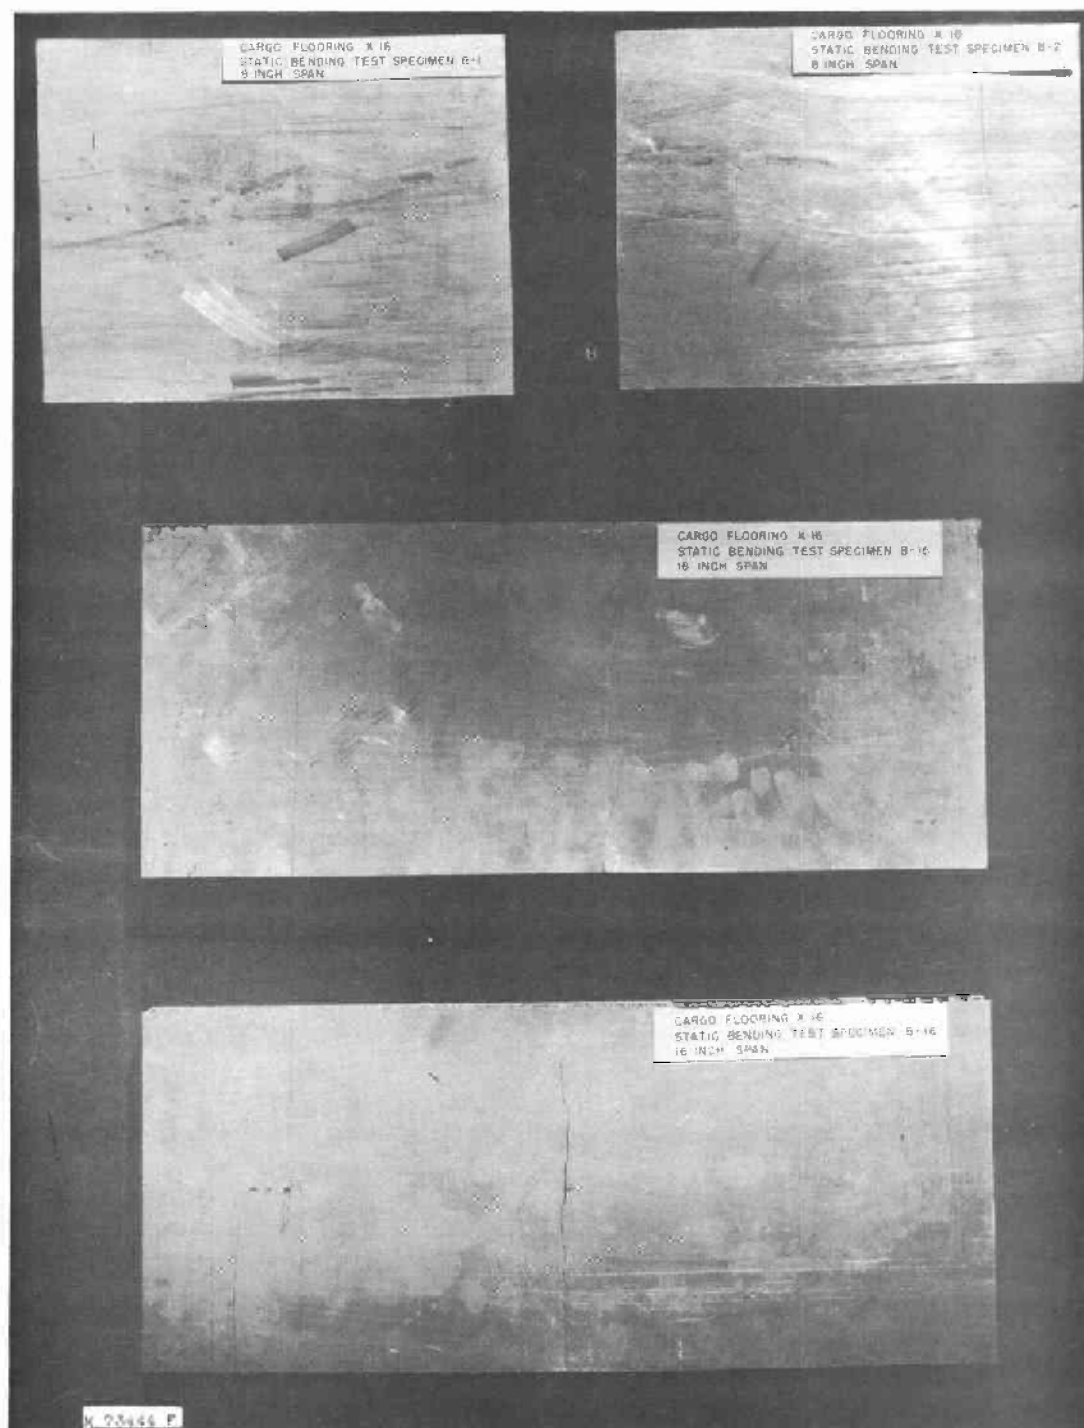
Static-bending test specimens (8- and 16-inch spans) showing appearance of lower (tension) surfaces after test. Note: tensile failure in aluminum face.
